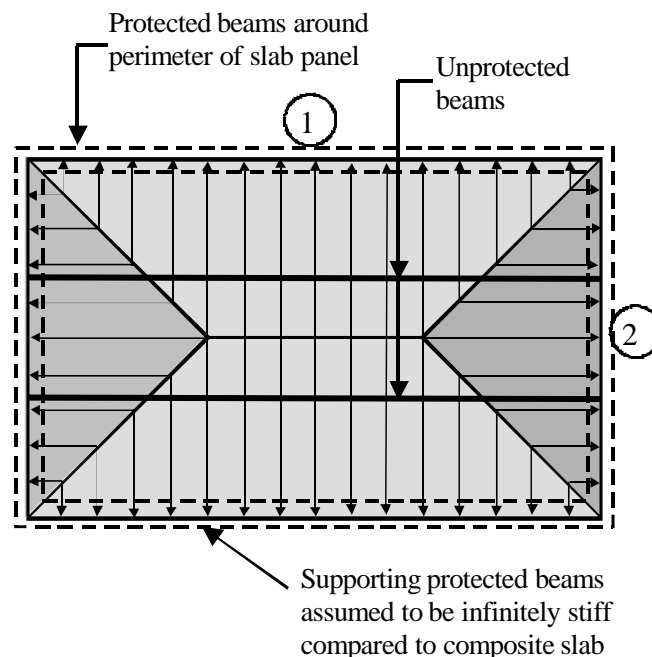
Assumed load distribution onto infinitely stiff supporting beams
